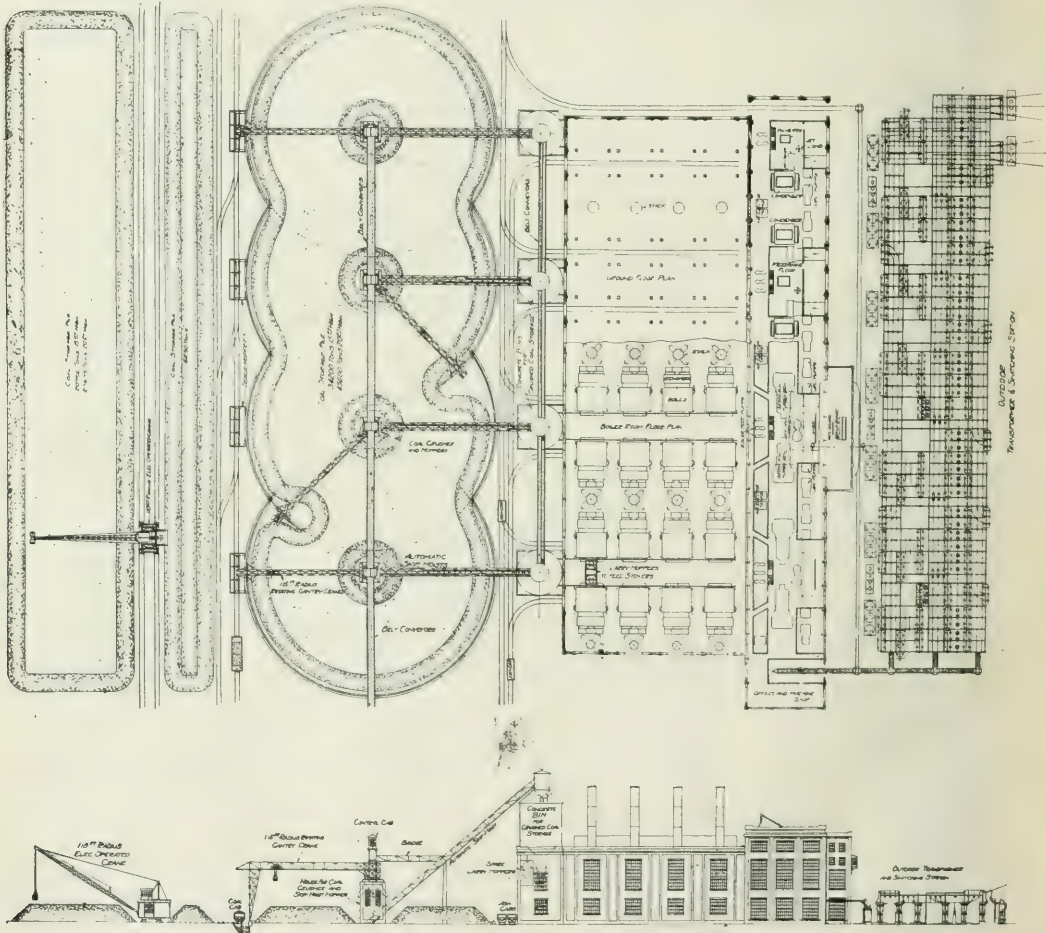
A POWER STATION OF 245,000 KW. PLAN AND ELEVATION.
